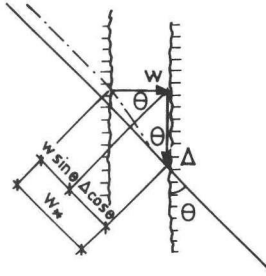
Pull-out slip for an inclined reinforcing bar
